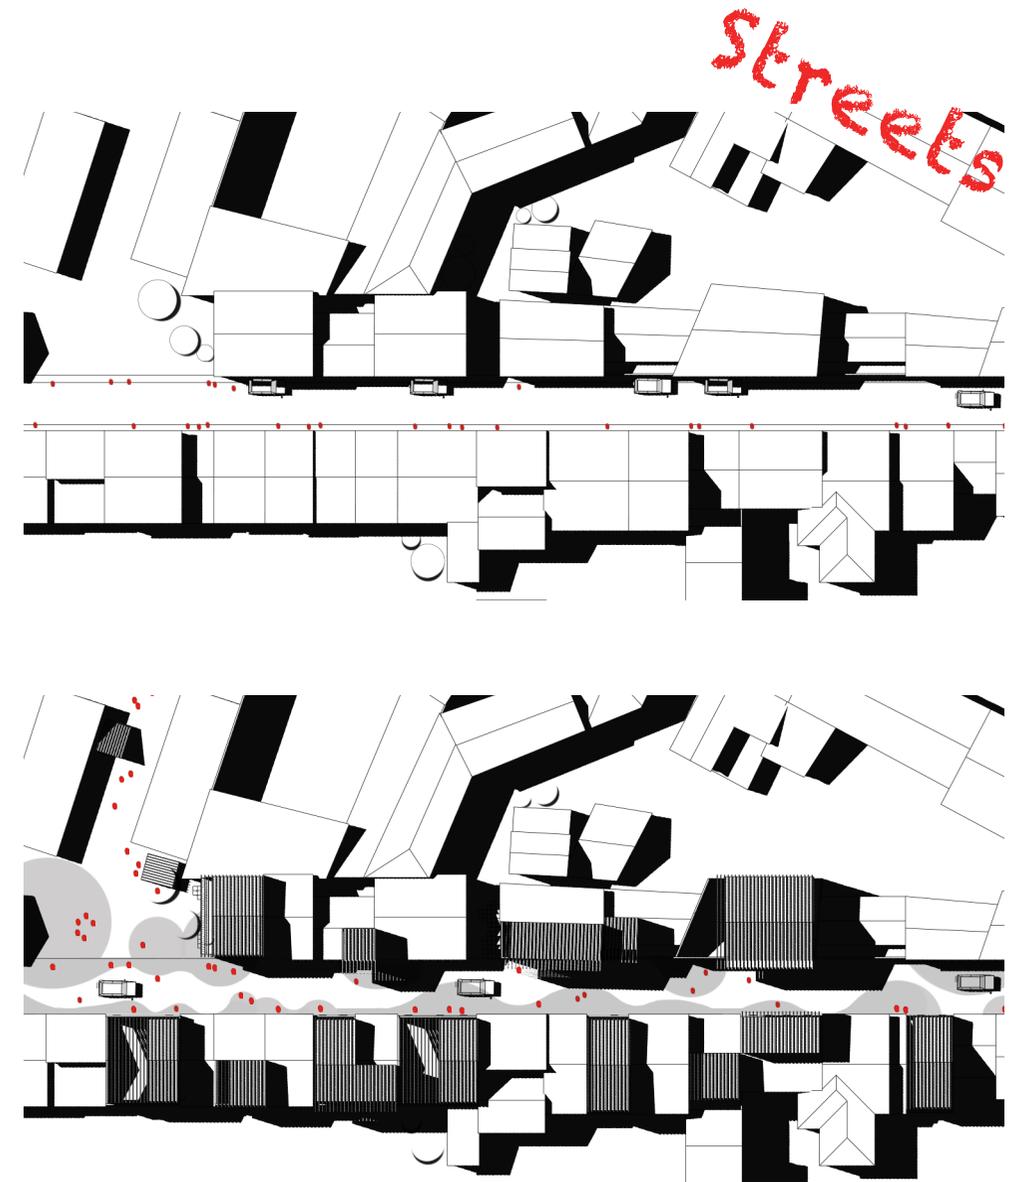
, Comparison of Street Intervention Before and After (partial street plan in Mazzini, Rimini), Author (2021)
